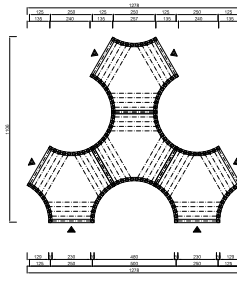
WUST Pavilion, version 1, plan view of the whole pavilion, 2014
